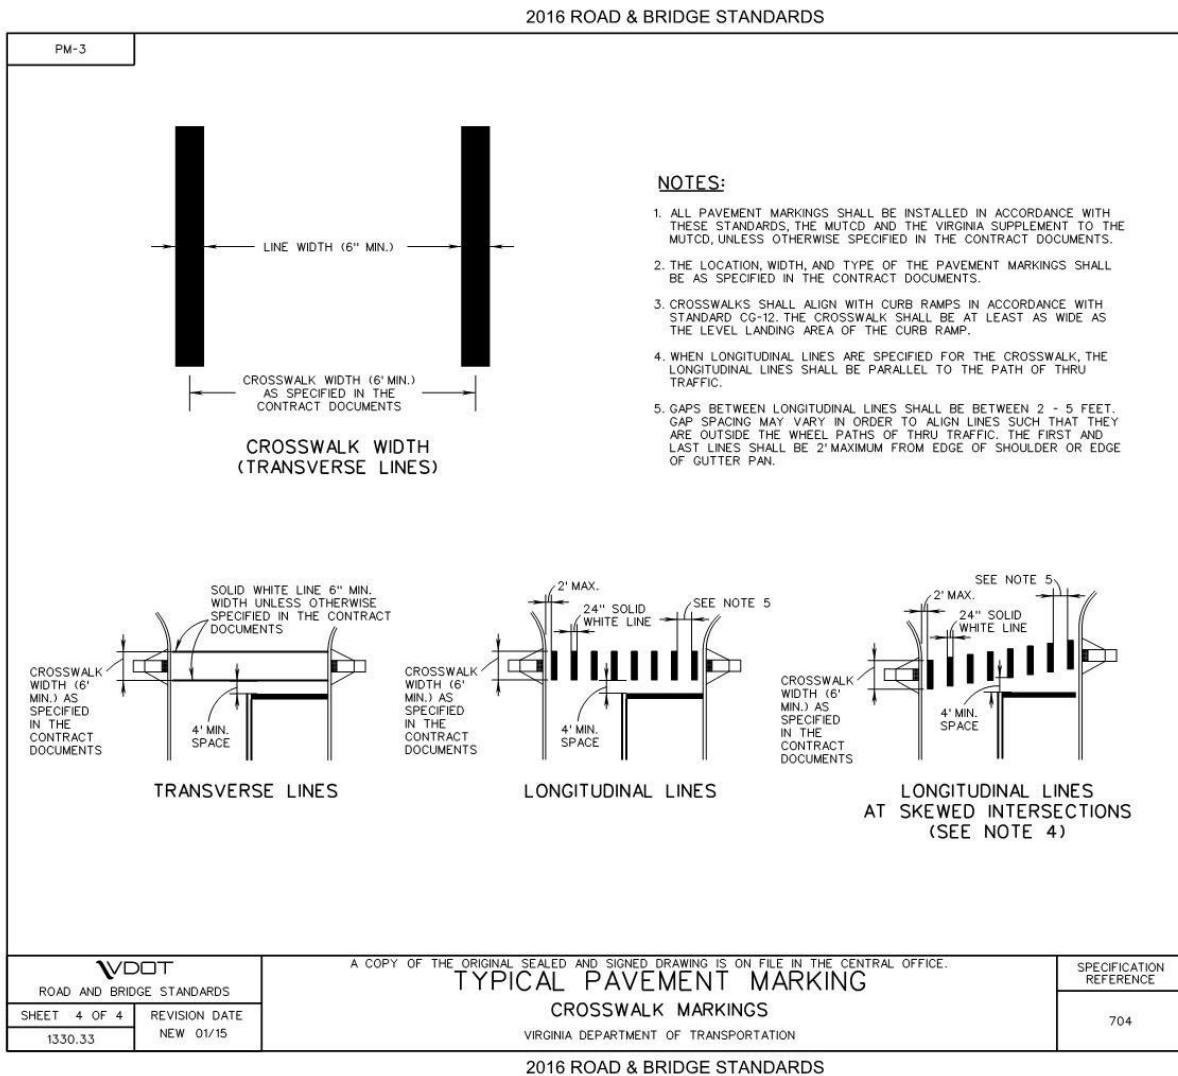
VDOT's 2016 Road and Bridge Standards PM-3 drawings showing typical pavement marking patterns for crosswalks, including transverse (parallel) lines, longitudinal lines (piano keys), and longitudinal lines at skewed intersections. Only one page of PM-3 drawing (Sheet 4 of 4) is shown in this figure and the remaining PM-3 pages can be found in VDOT's 2016 Road and Bridge Standards.
